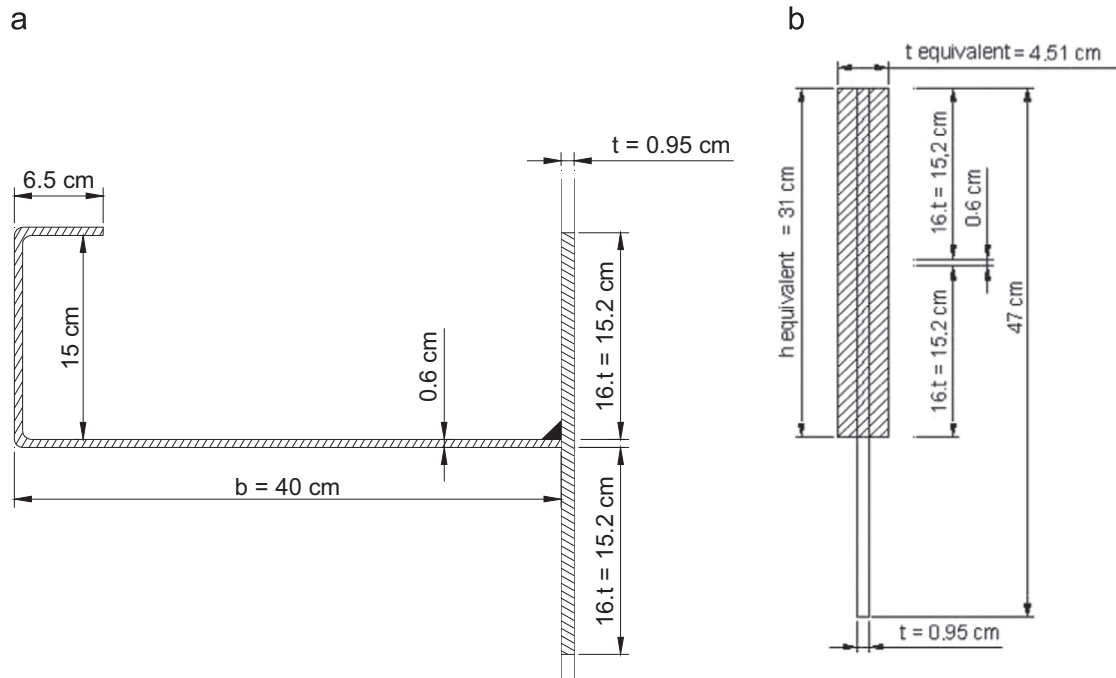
Wind girder (a) details of wind girder and (b) simplified model with equivalent thickness.
